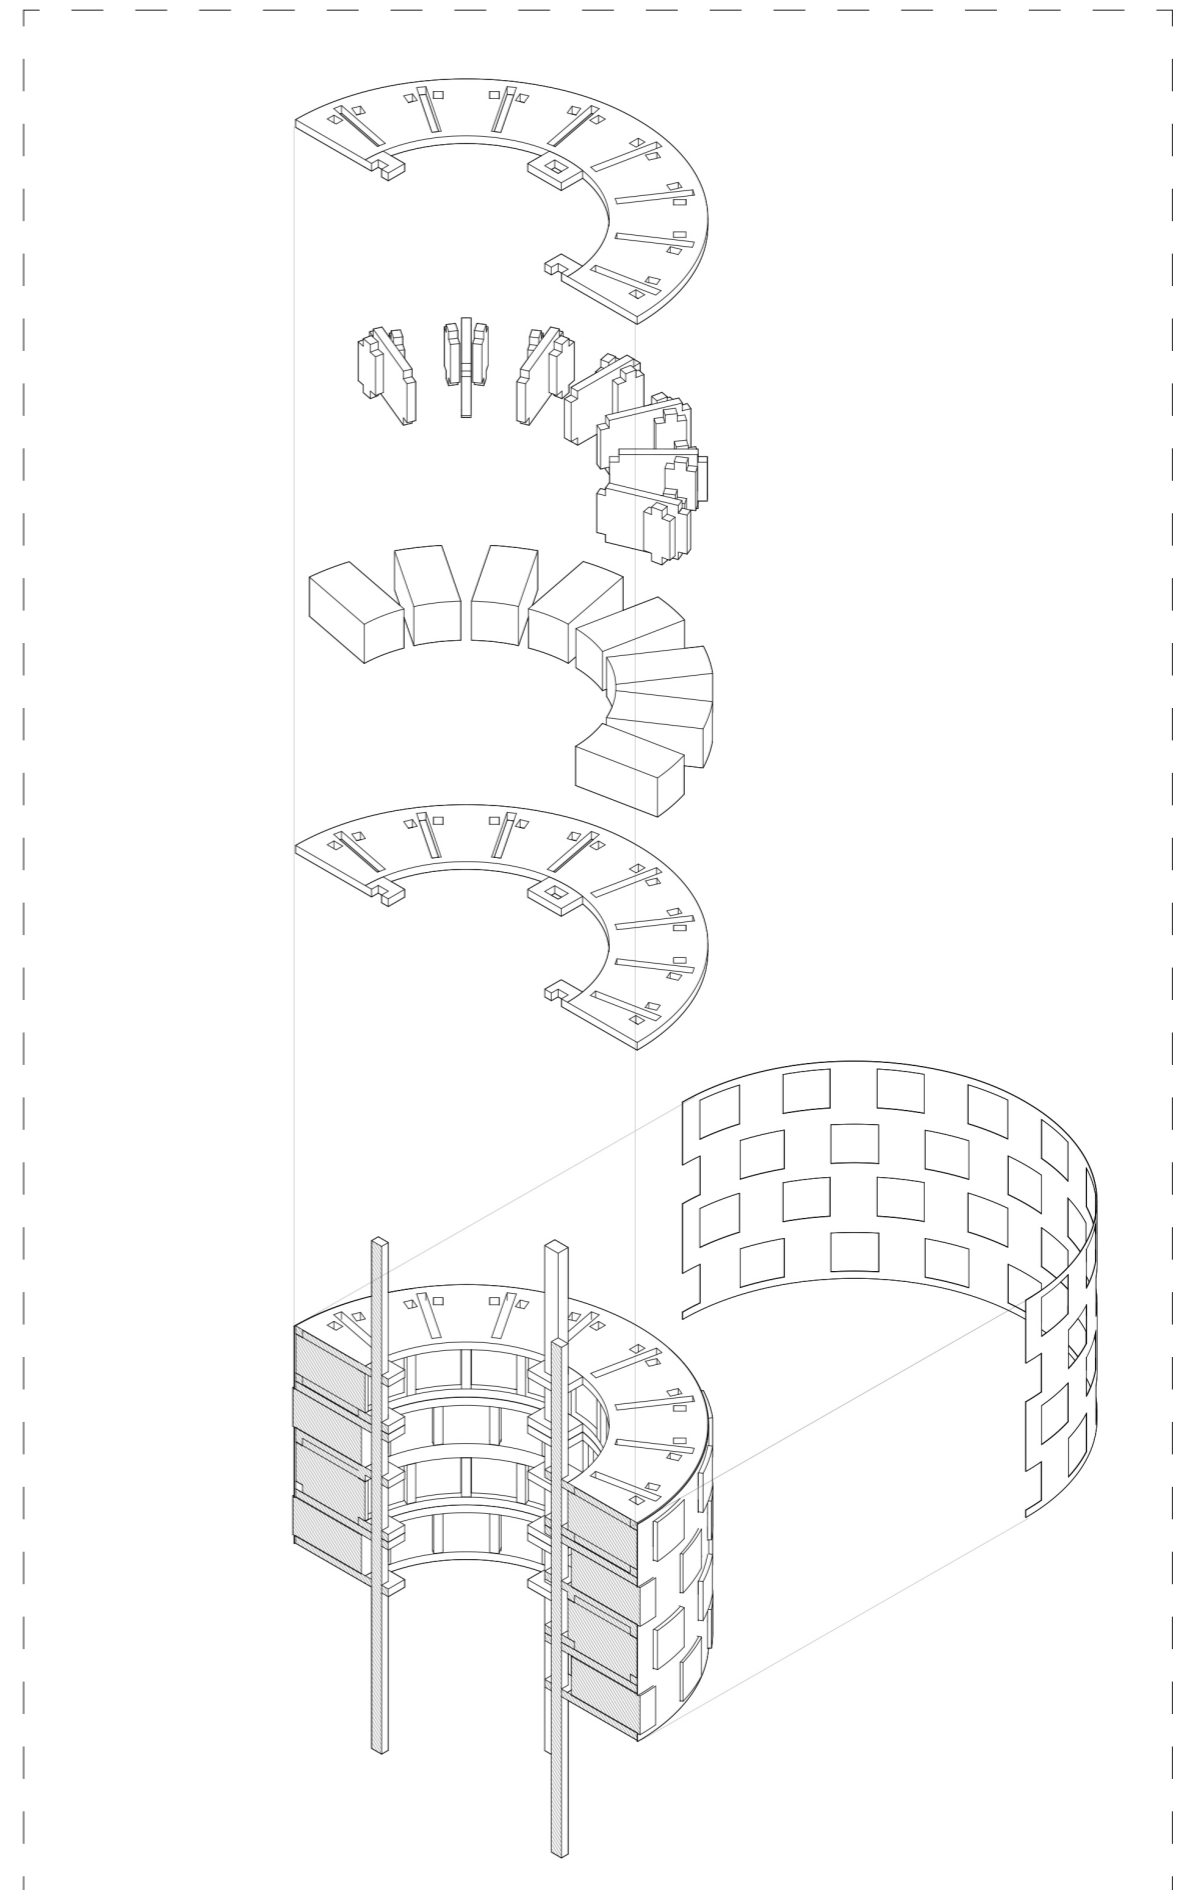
Prasad, S. Exploded Section Drawing of Drawer System , 2019.
